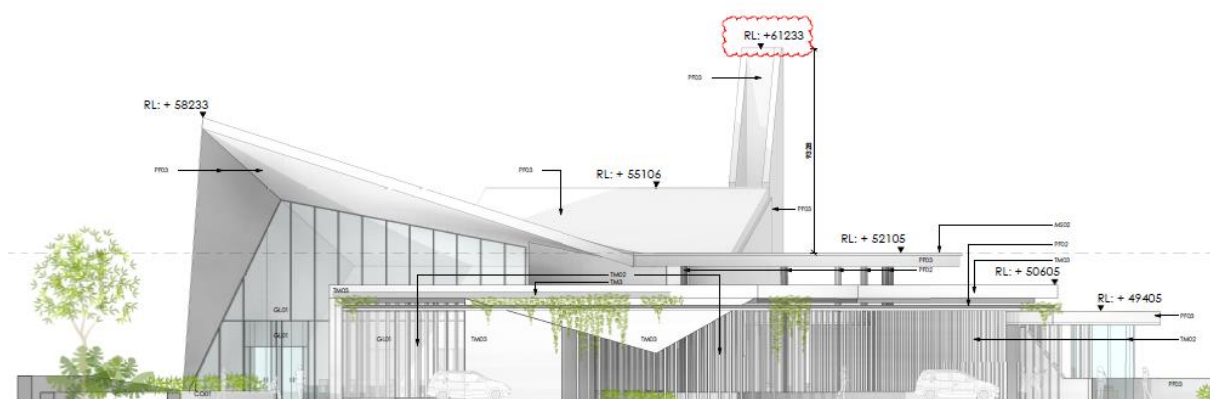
Drawing of crematorium southern elevation (Source: MDK Architects)
